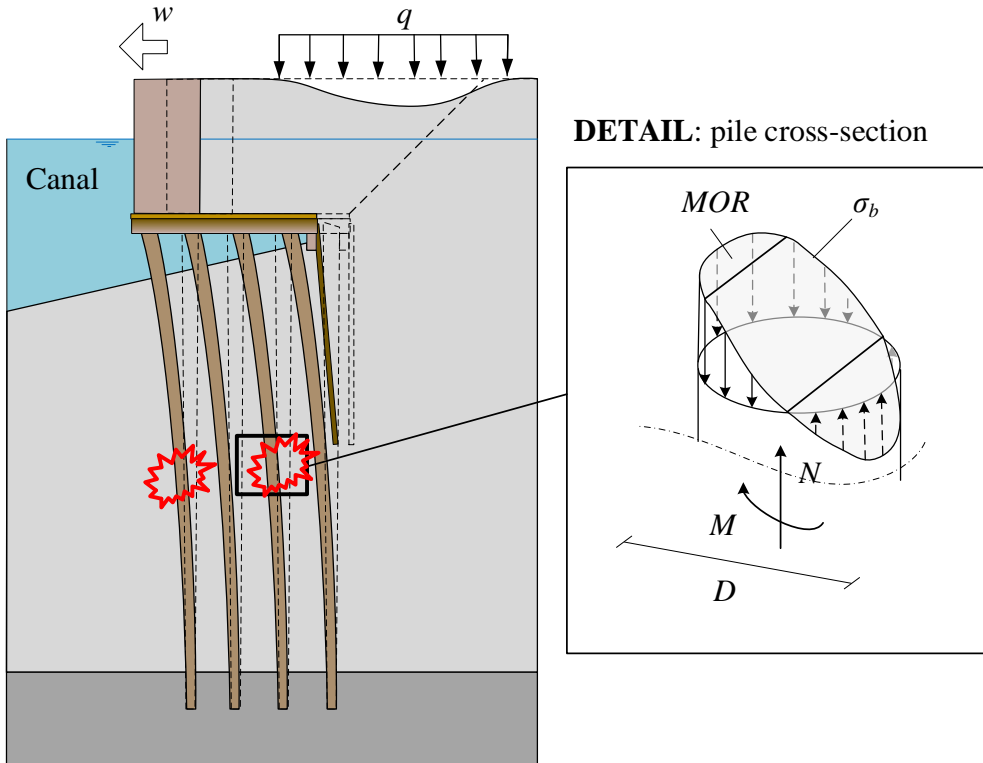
, Failure mechanism ‘Lateral failure of the quay wall foundation’. Detail of pile cross-section is provided in which bending stresses are indicated.
